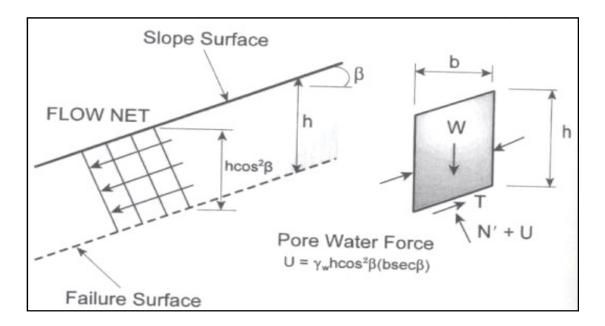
Infinite slope failure in soil with seepage parallel to slope (Source: Abramson et al. 2002)
